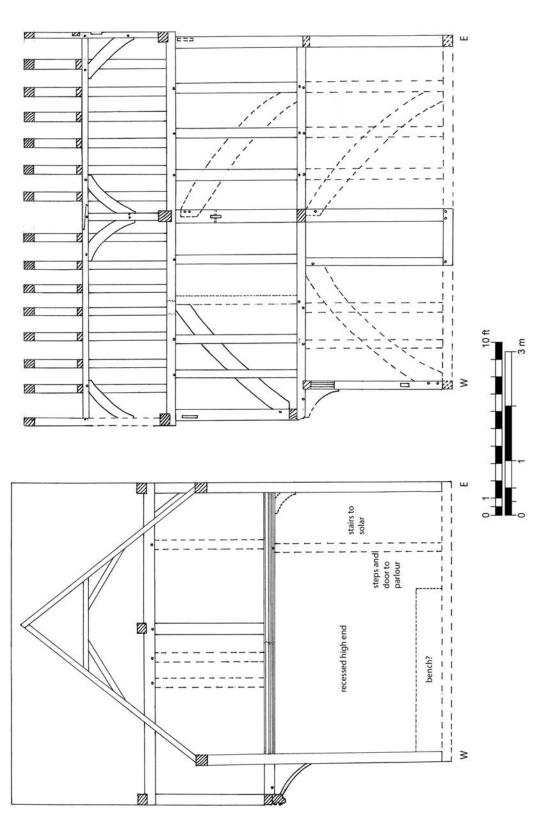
(left) and (right) E to W section of Part A high end cross-wing and hall and (right) section of Part B service cross-wing, The Stockwell Arms, 18 West Stockwell Street (corpus no. 101). Drawn by Richard Shackle
